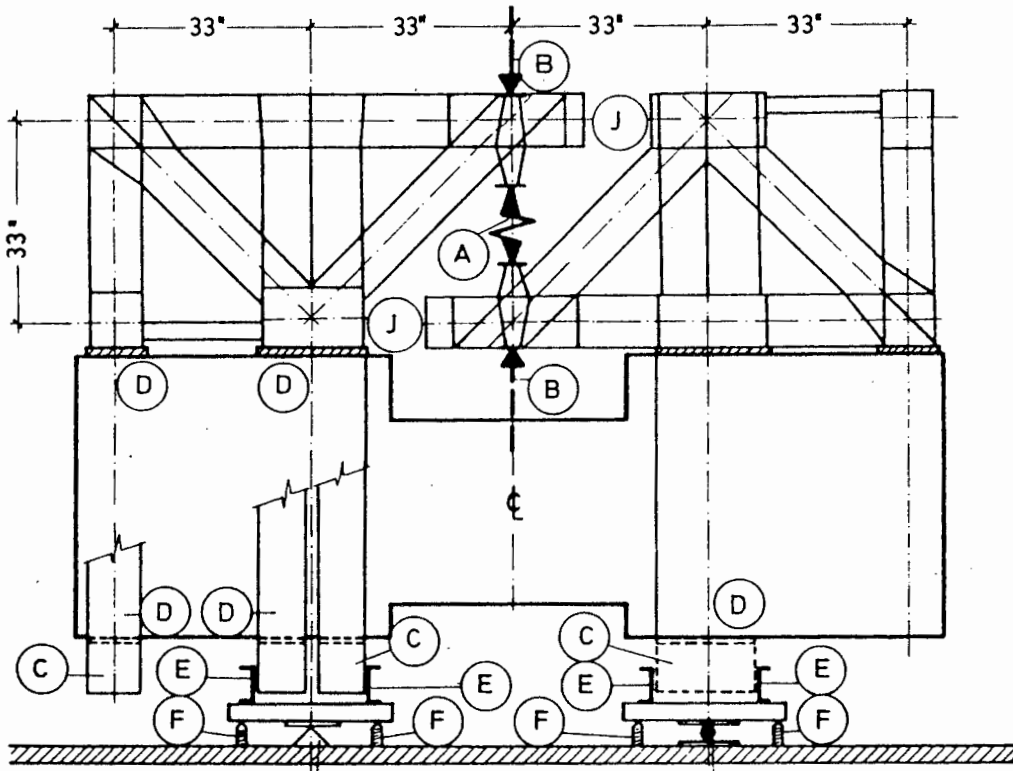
(a) : Coupling Beam 311: The Loading Frame and Test Beam Assembly<sup>(3)</sup>
